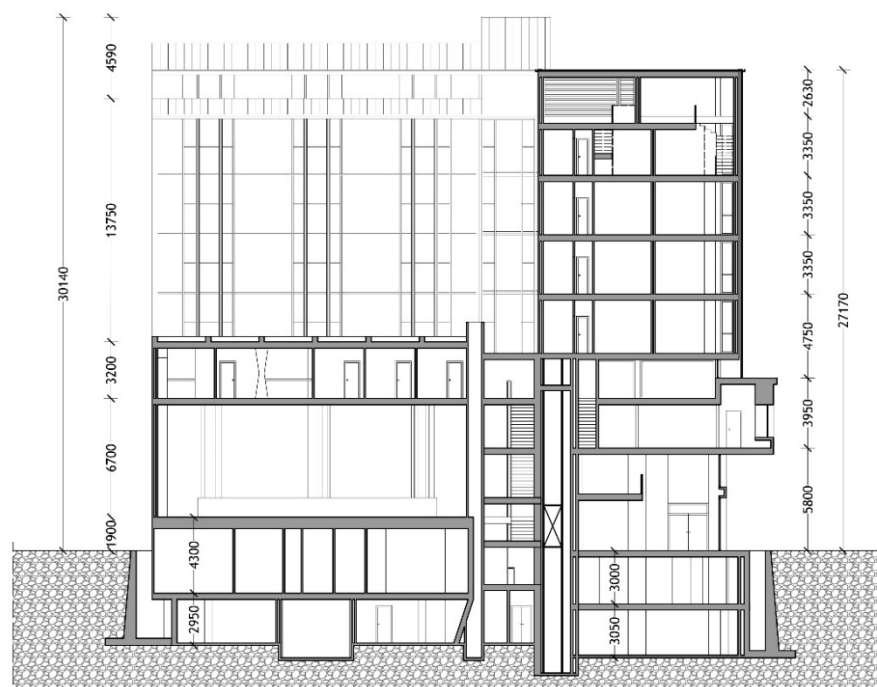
Vertical section of the building denoted as B-B in the structural plans
